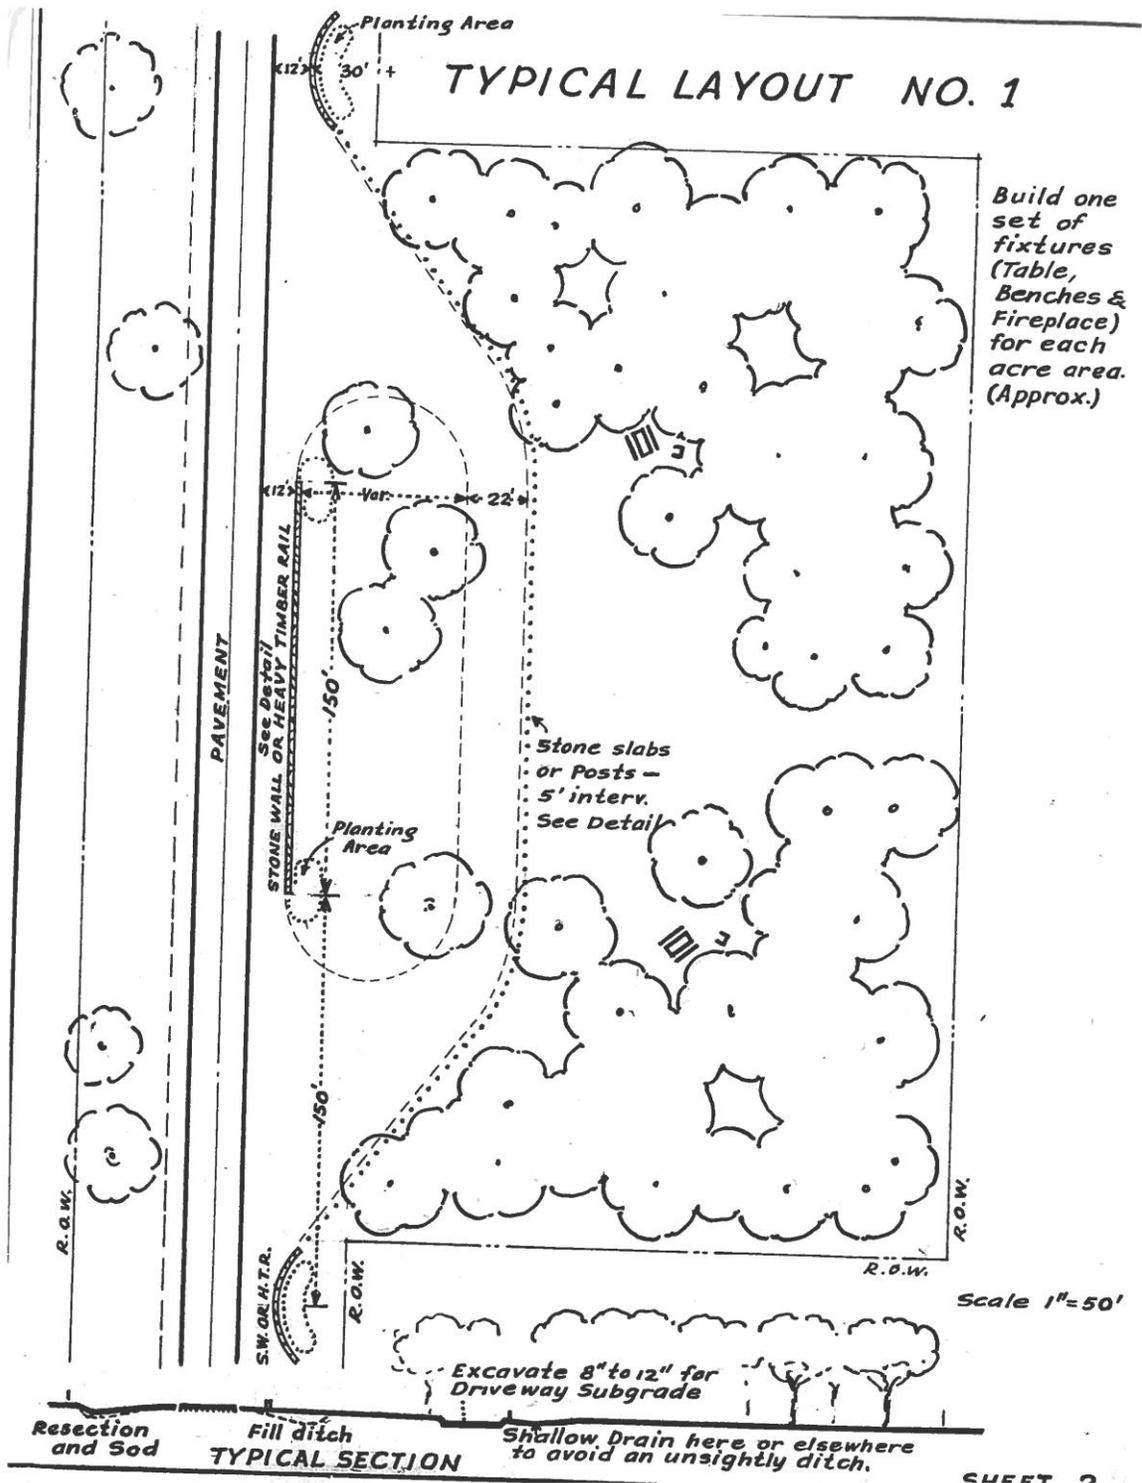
Typical roadside park layout no. 1 designed by Gubbels (1936).
